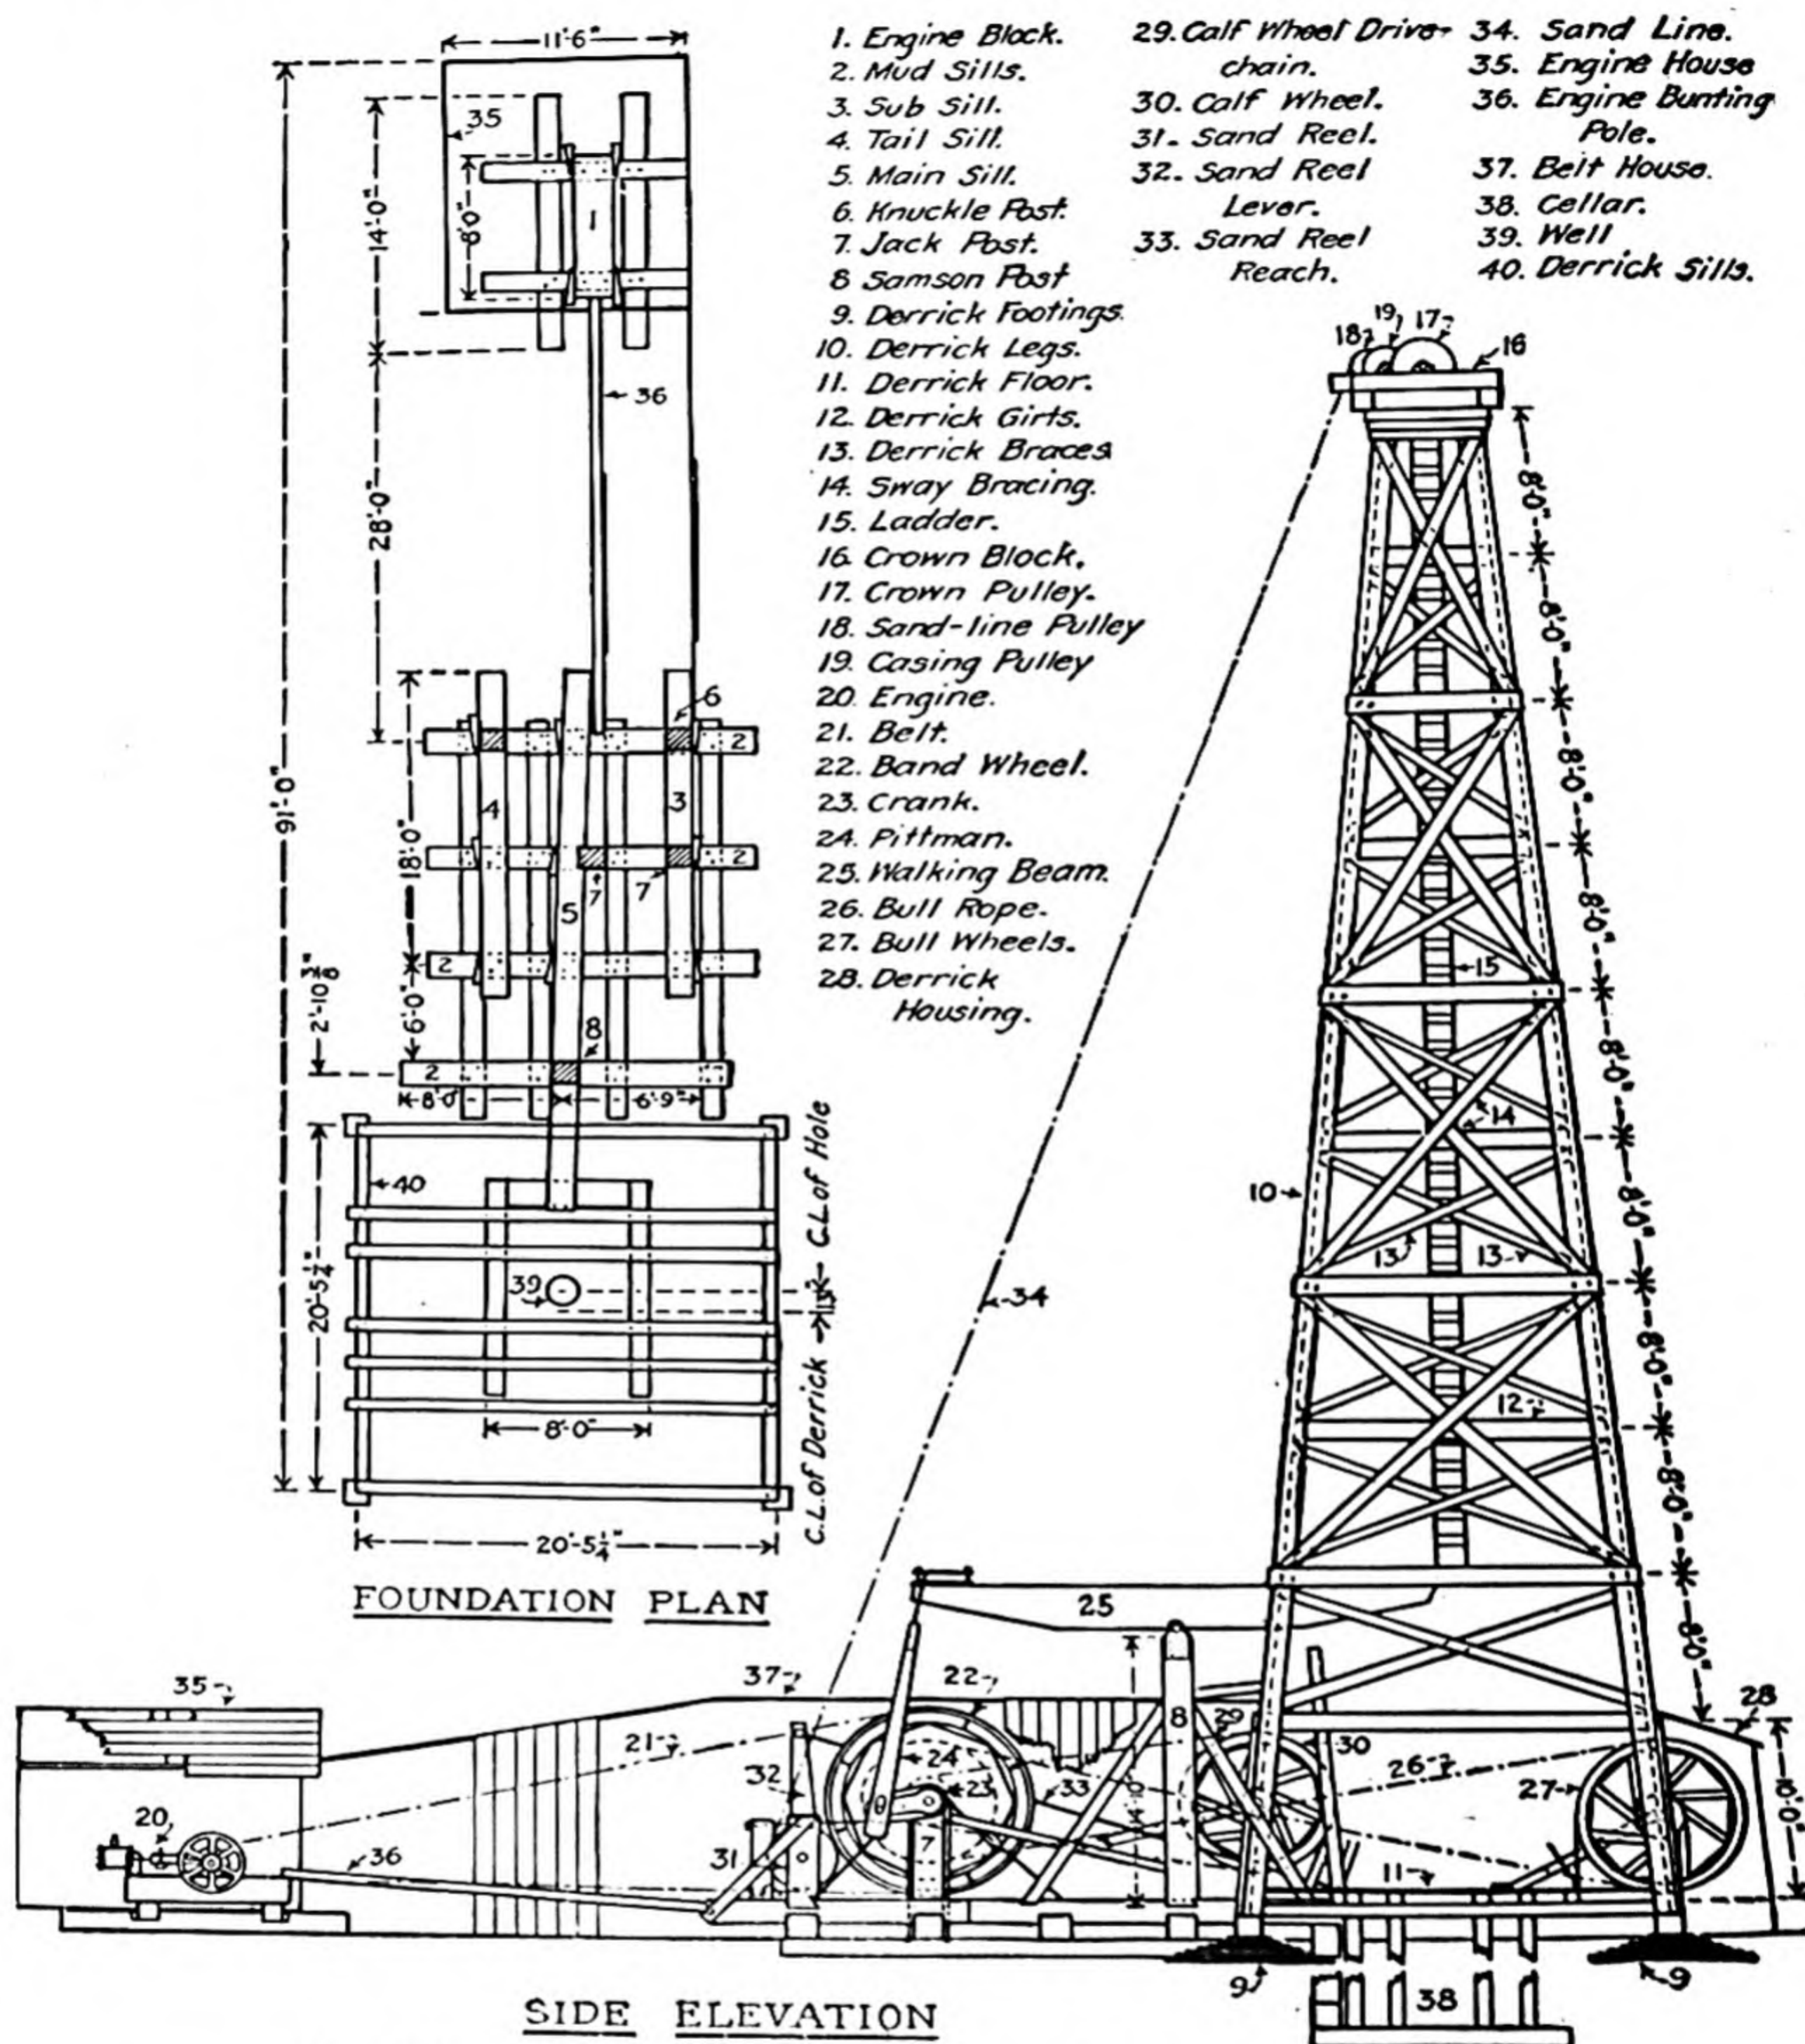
Plan and elevation of an 82-ft. standard cable rig.
